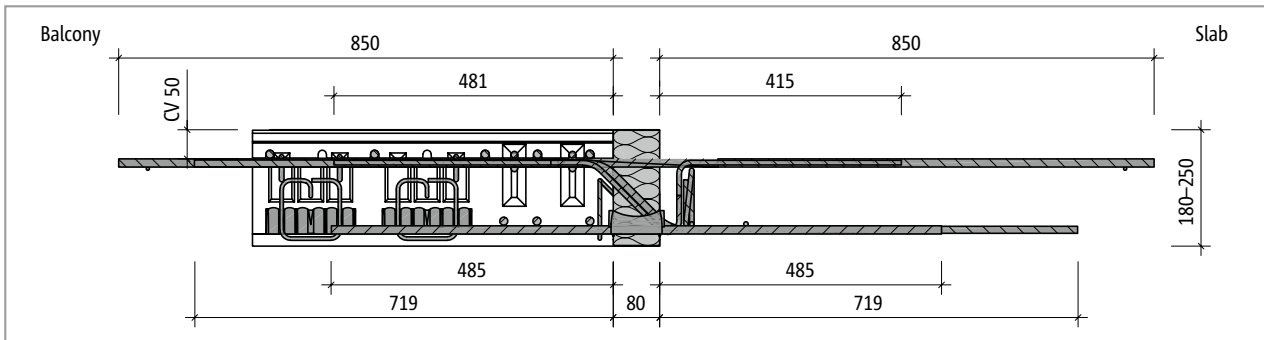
Schöck Isokorb® T type C-M2: Product section
